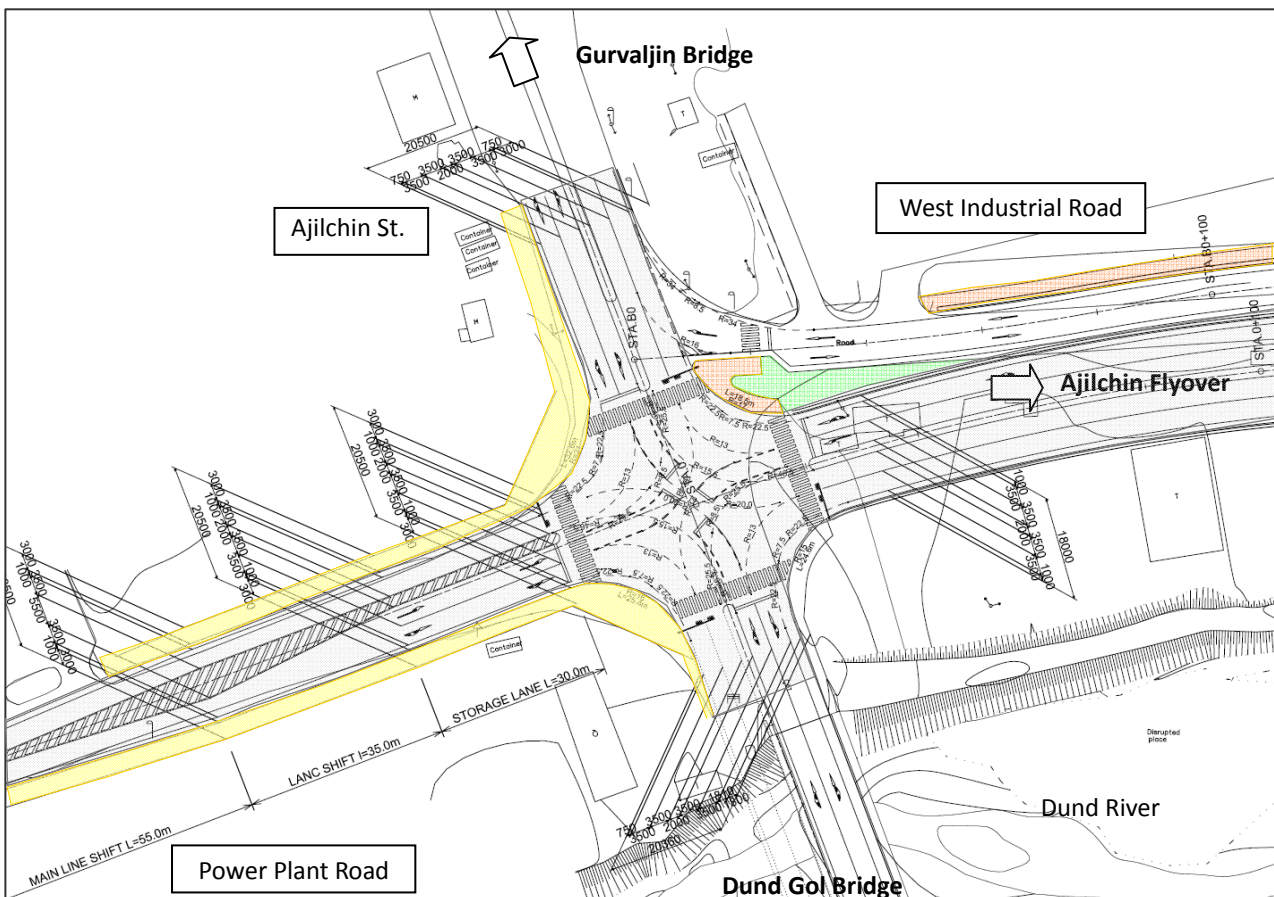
Plan of Intersection with Ajilchin Road
